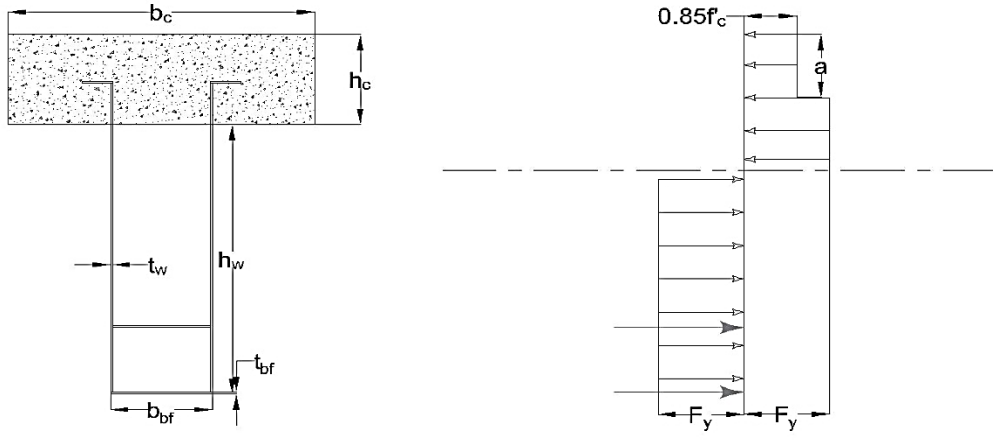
9 Composite section of multi flanged U steel section with one intermediate flange
